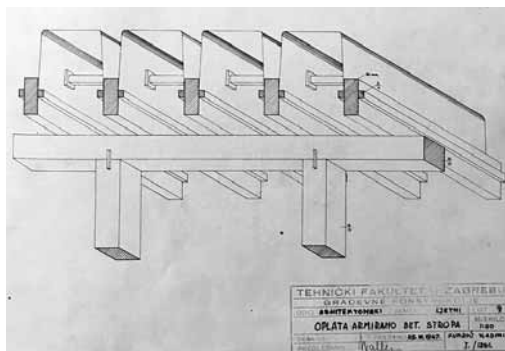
Reinforced concrete structures, formwork, course Building Constructions I
